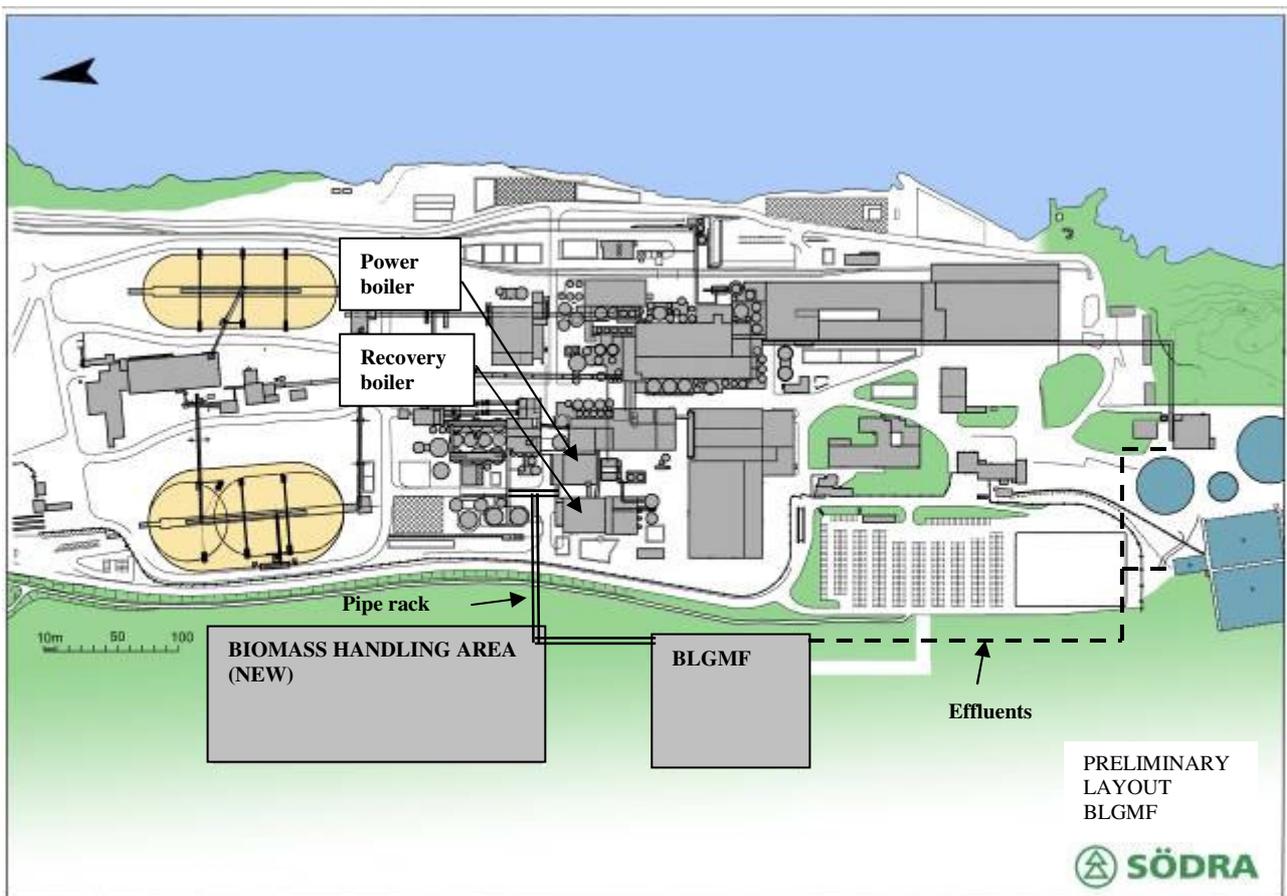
Interconnecting piping between the Mörrum mill and BLGMF.
